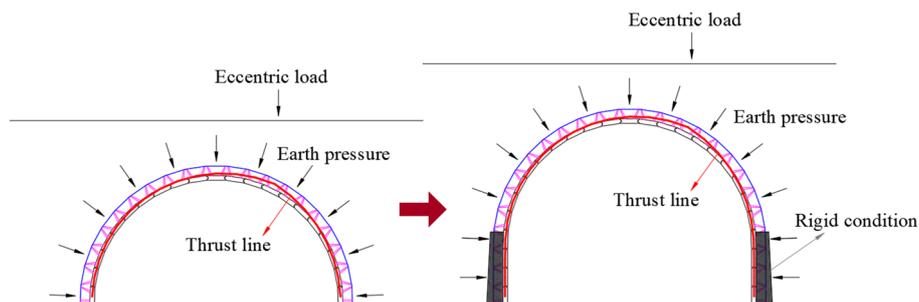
Thrust line of improved modular underground arch culvert structure with vertical wall
